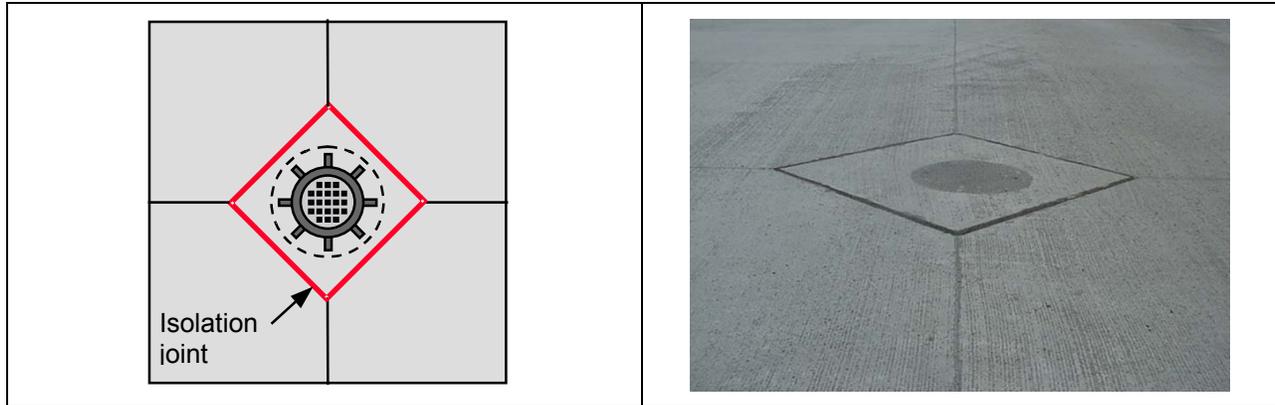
Square boxout (figure courtesy of American Concrete Paving Association. Photo taken at Aero Road and Westbow Road intersection, Spokane County, Washington).
